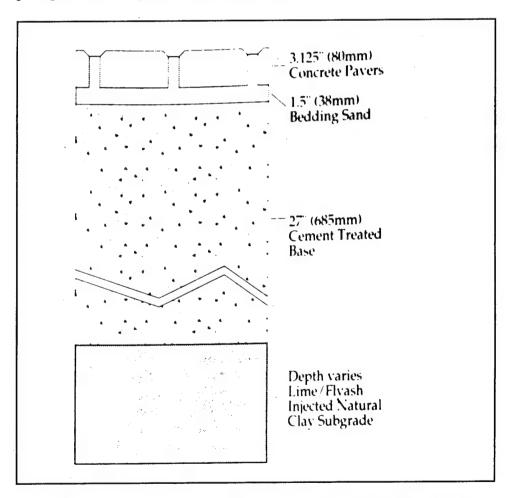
Cross section of base for concrete paving blocks at Dallas Fort Worth International Airport (from King and Smith 1991)
